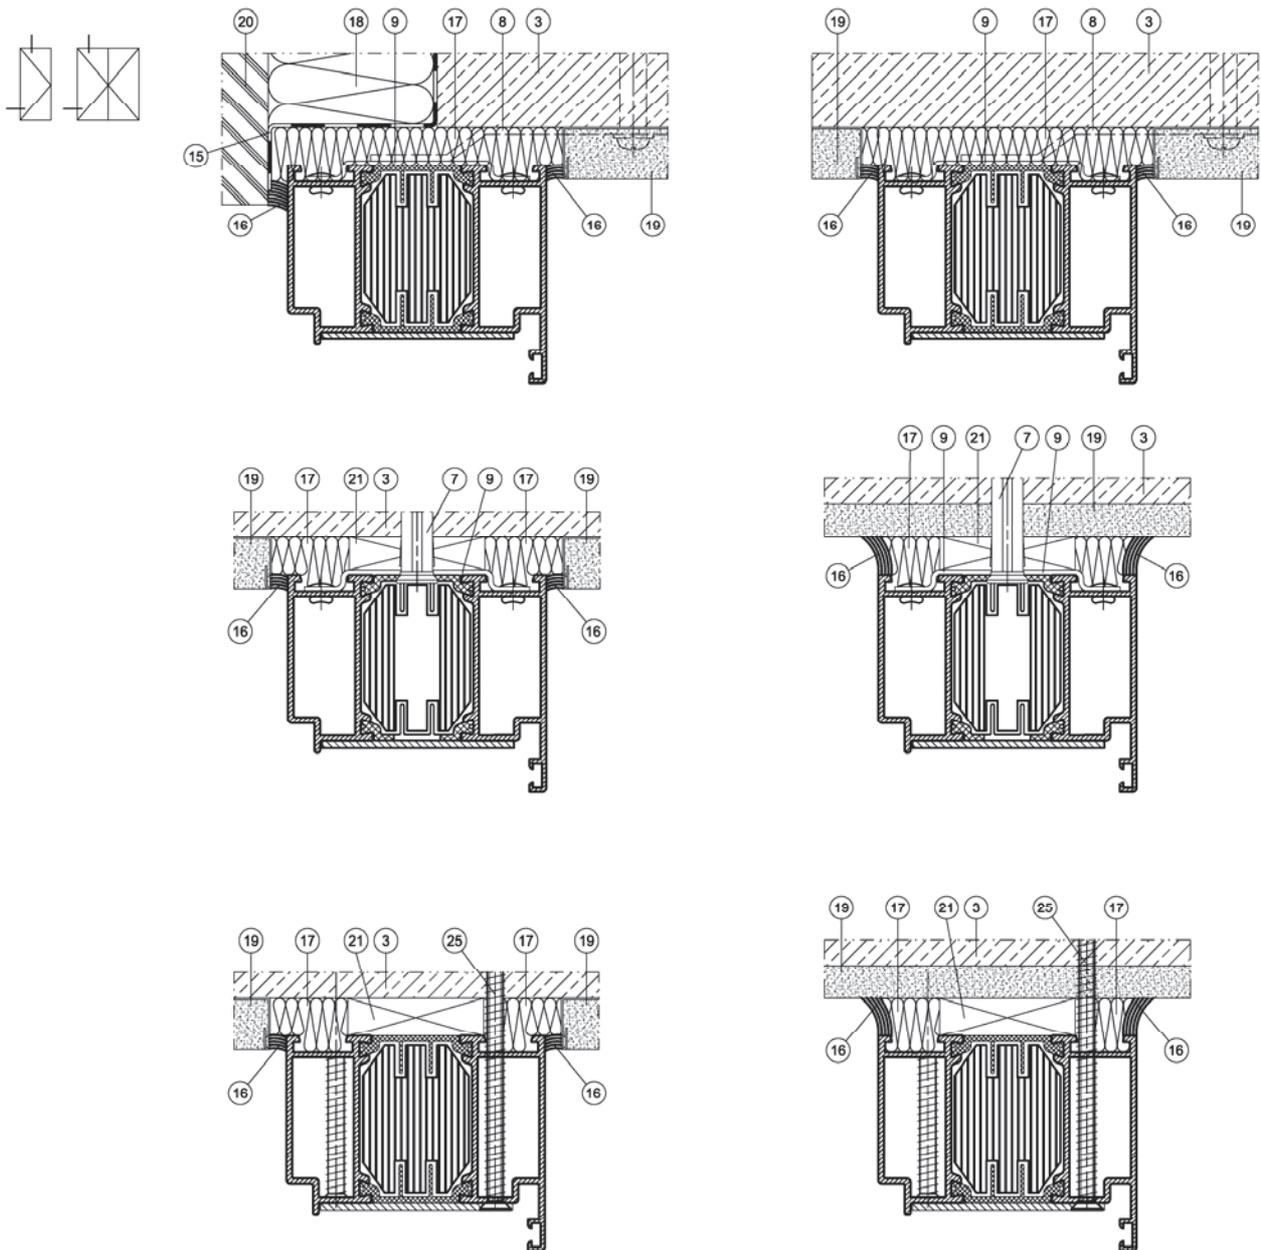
Sealing variants for door/technical window/door system frame-to-building structure connection
